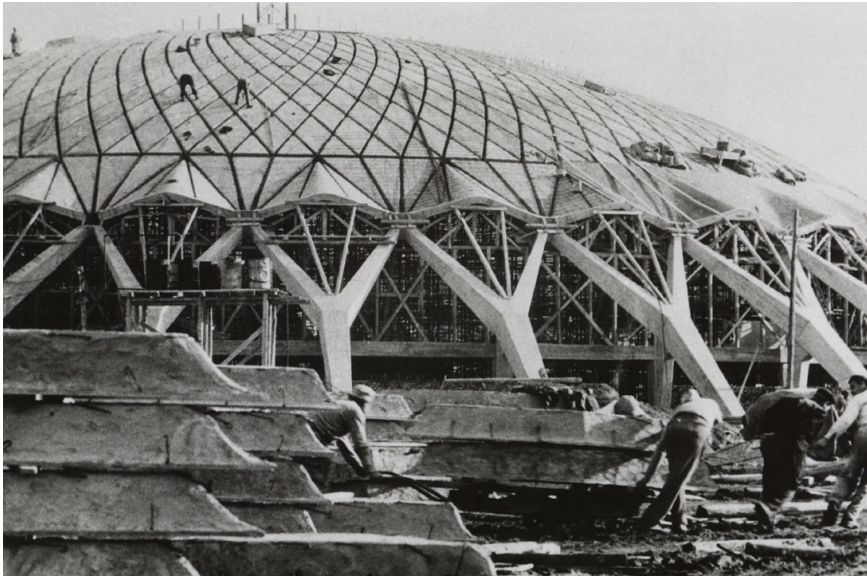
Pier Luigi Nervi's Palazzetto dello Sport under construction, showing the precast stay-in-place formworks (photo credit: Fondazione MAXXI, P. L. Nervi Archive).
